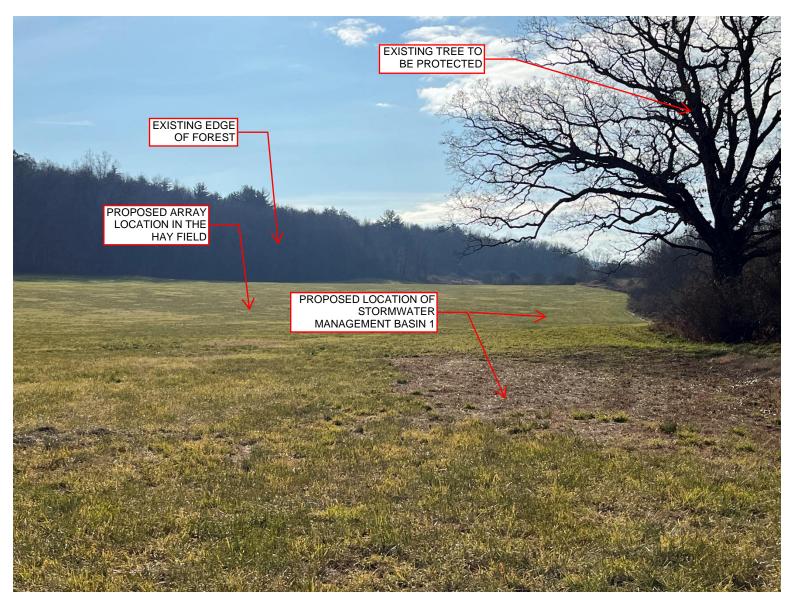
VIEW LOOKING SOUTH FROM NORTHWEST CORNER OF PROJECT SITE
